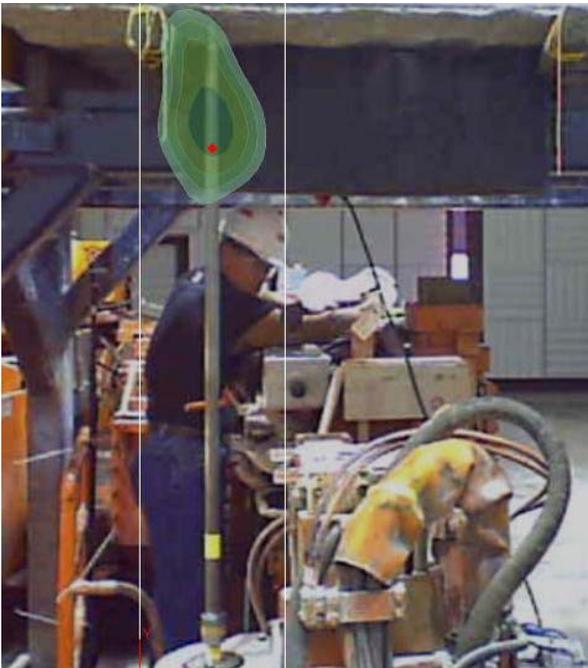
Beamforming of drilling with the jaw-type coupling, 96 dB(A) at the operators' position.
